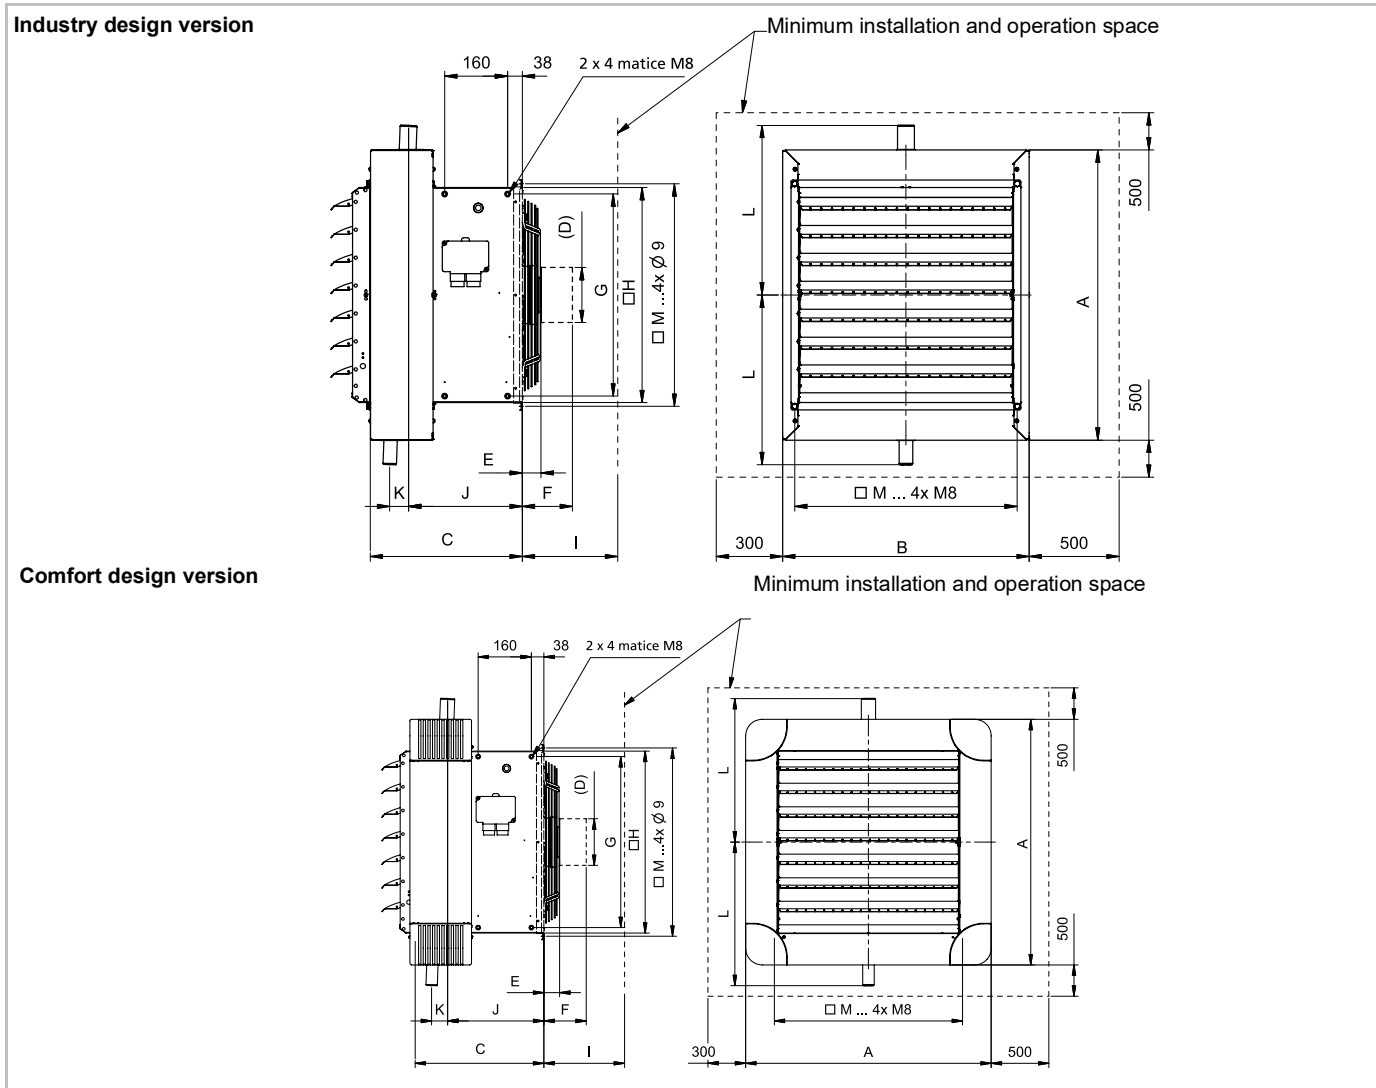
Heating unit dimensions and heat exchanger connection
